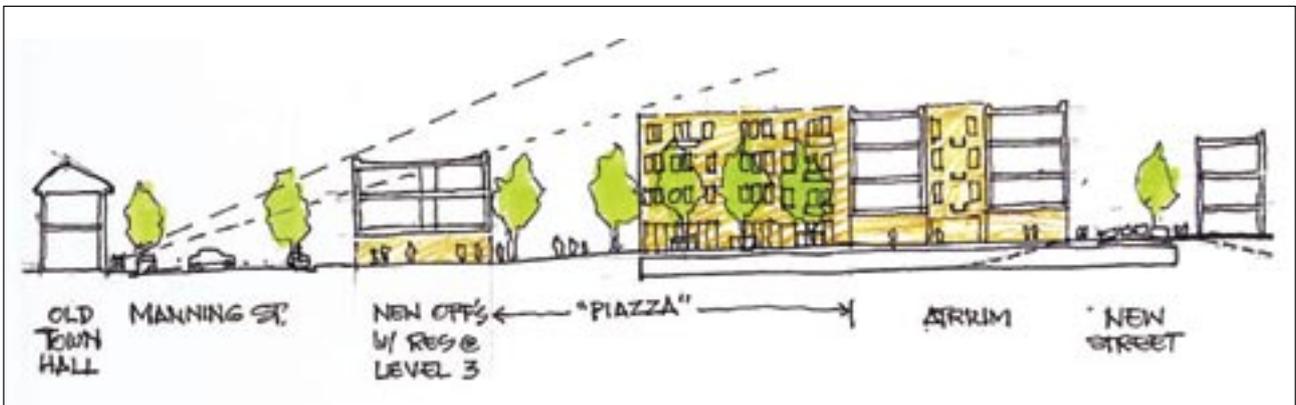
Site Section showing how level 4 is not visible from Manning Street
